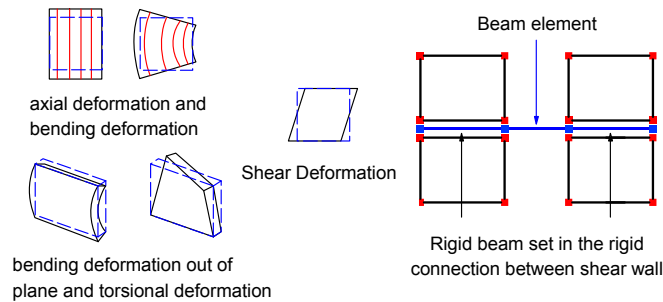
Layered element of shear wall Figure 4: Rigid arm set in shear wall
